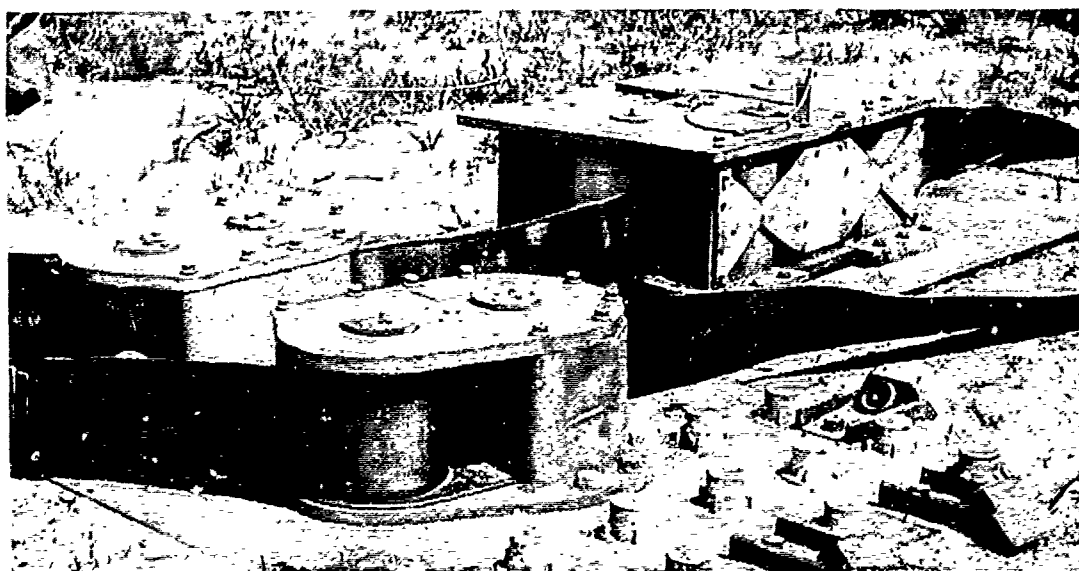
Dual BAK-12 Arresting System Expeditionary Installation of Deck Sheave
